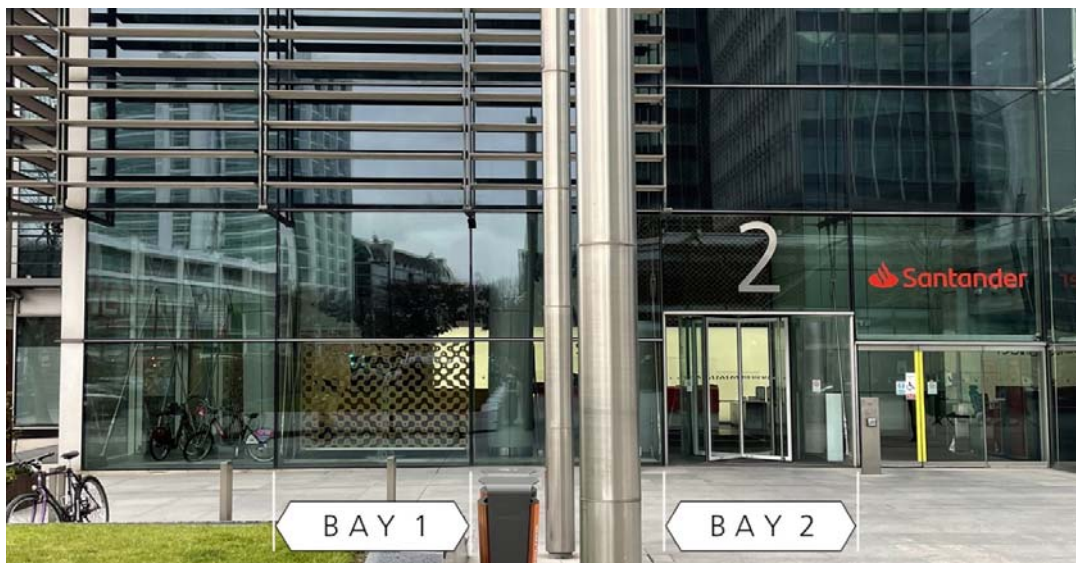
Street level elevation, Regent's Place plaza with proposed alterations to entrance bays indicated
